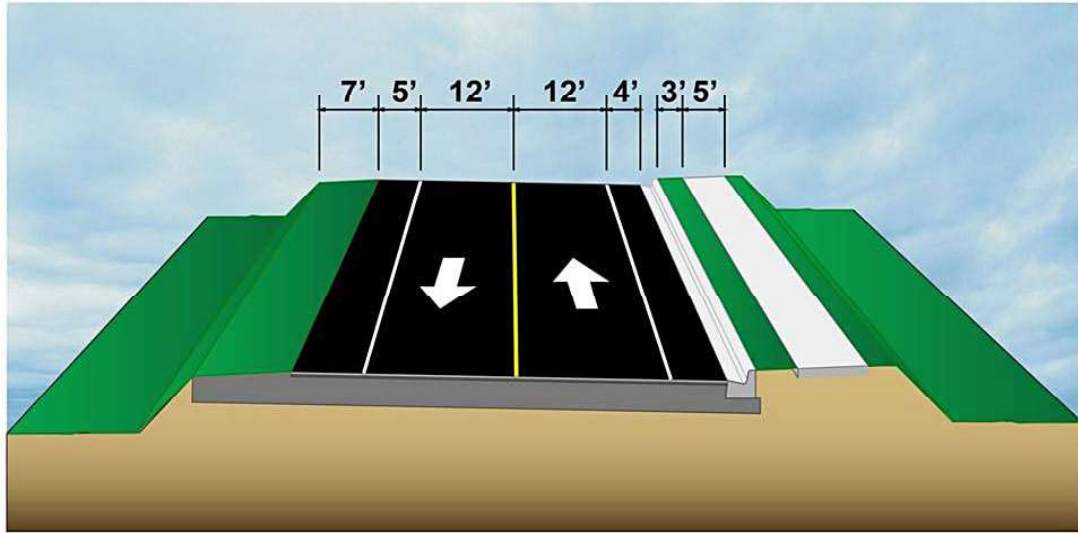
Two-lane typical section for Fort Hamer Road.
